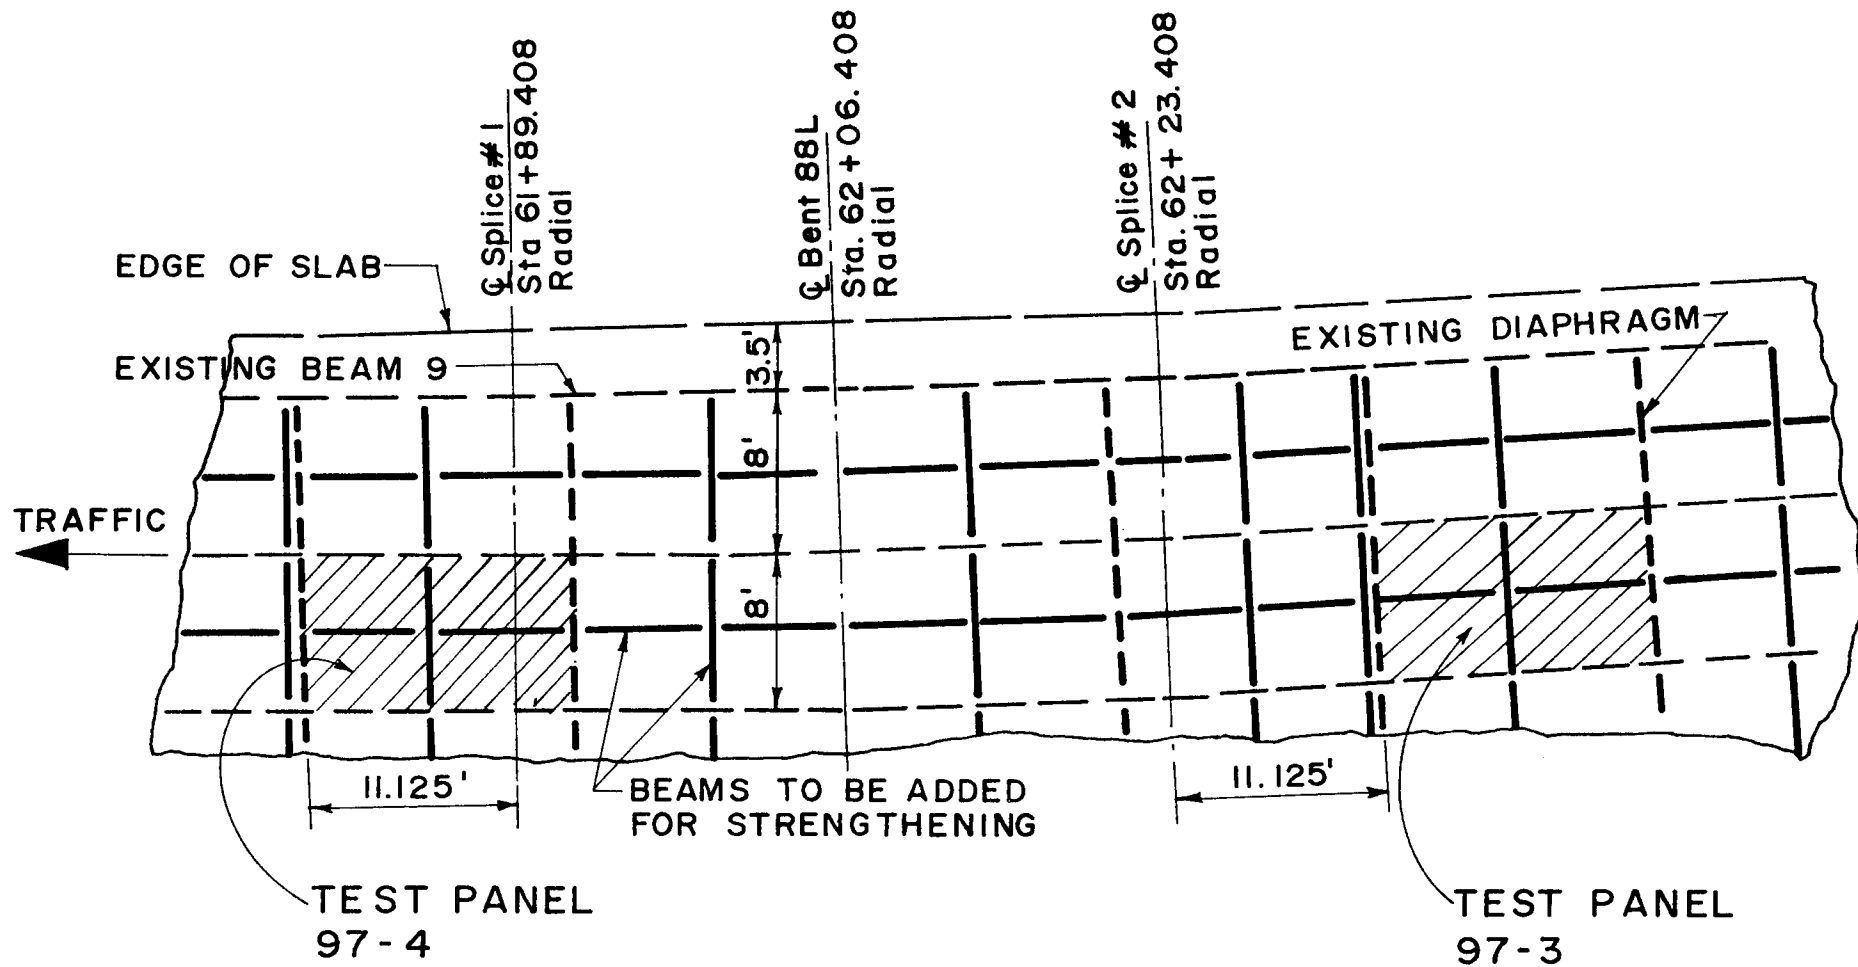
STRUCTURE 97-- LOCATIONS OF TEST PANELS.
